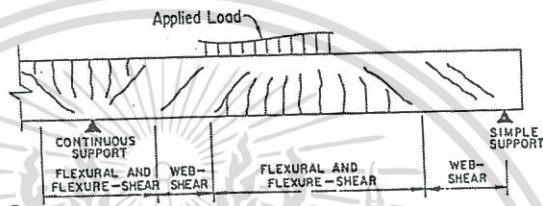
Types of cracking in concrete beams
